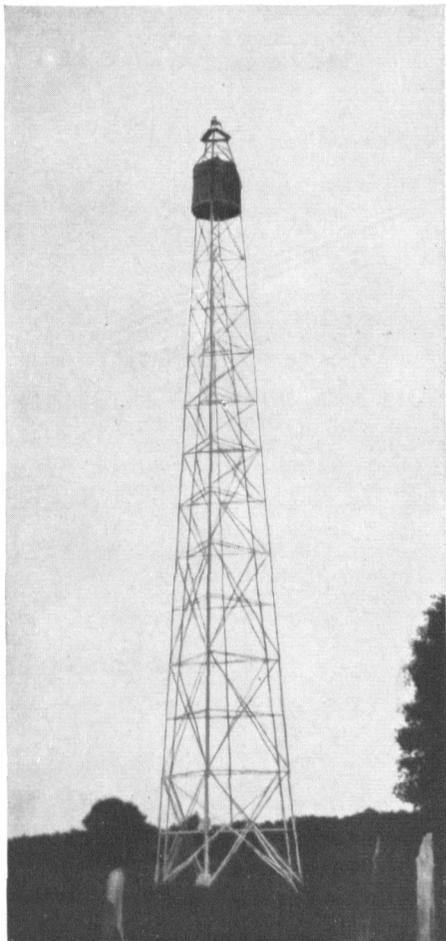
Ninety-foot Bilby steel tower, complete, showing observing tent.
